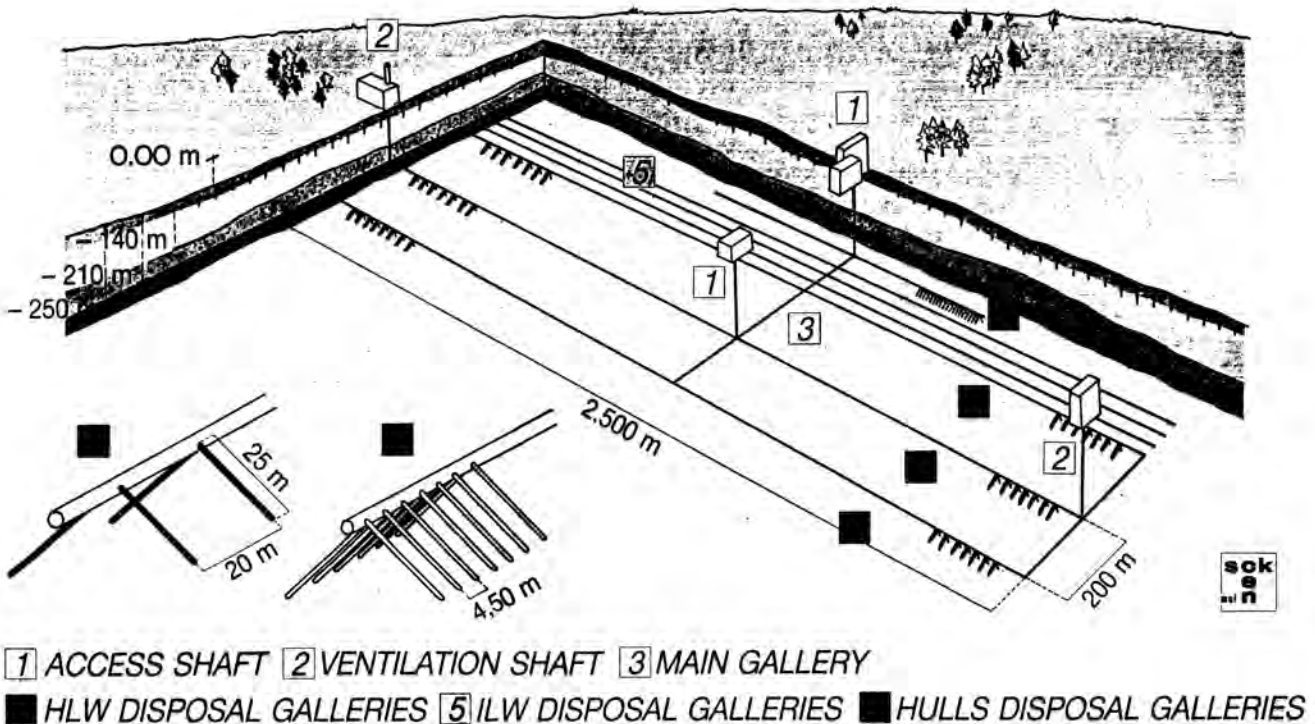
General Layout of Underground Facility for Axial Disposal Concept.
